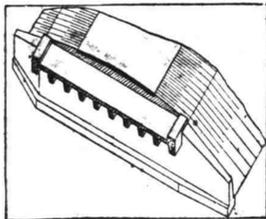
CONCRETE CULVERT STEEL I BEAM INCASED IN CONCRETE.
